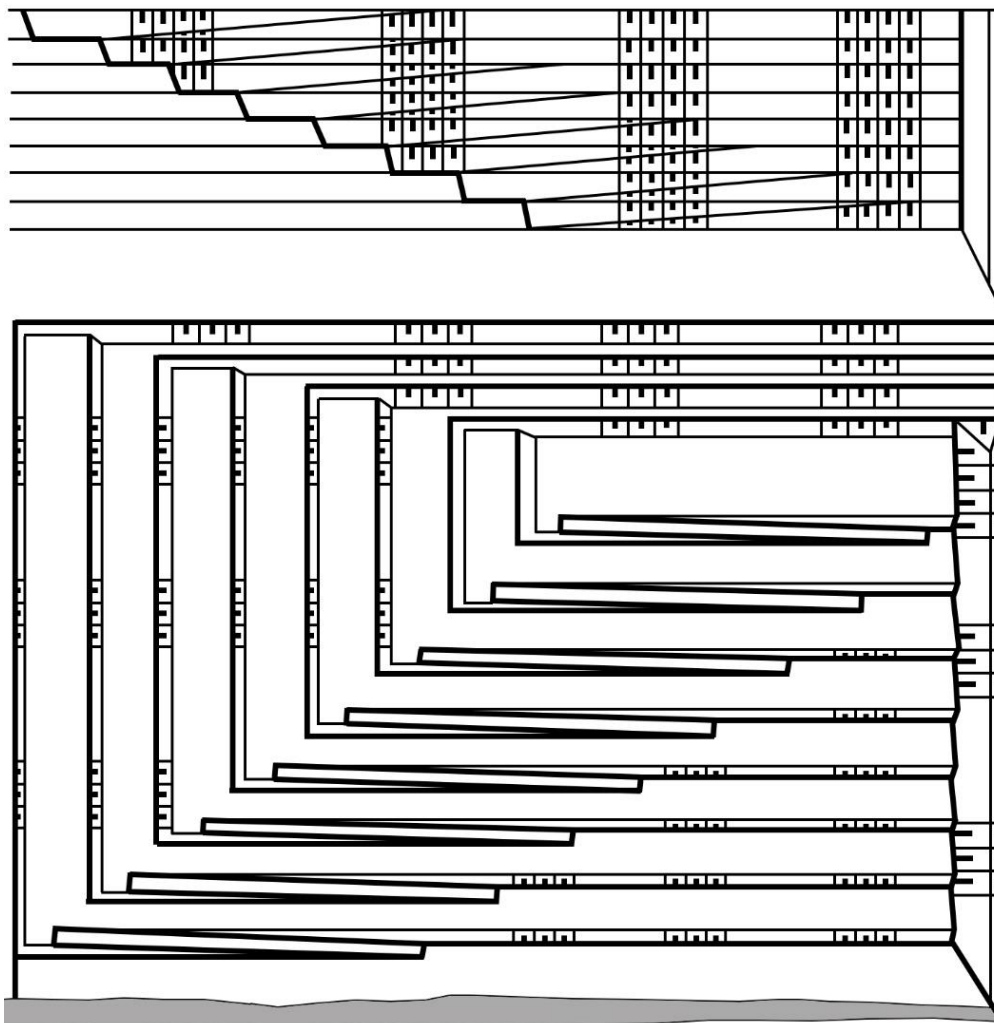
Opening-up of the upper zone with sliding ramps located on the working side of the open pit
